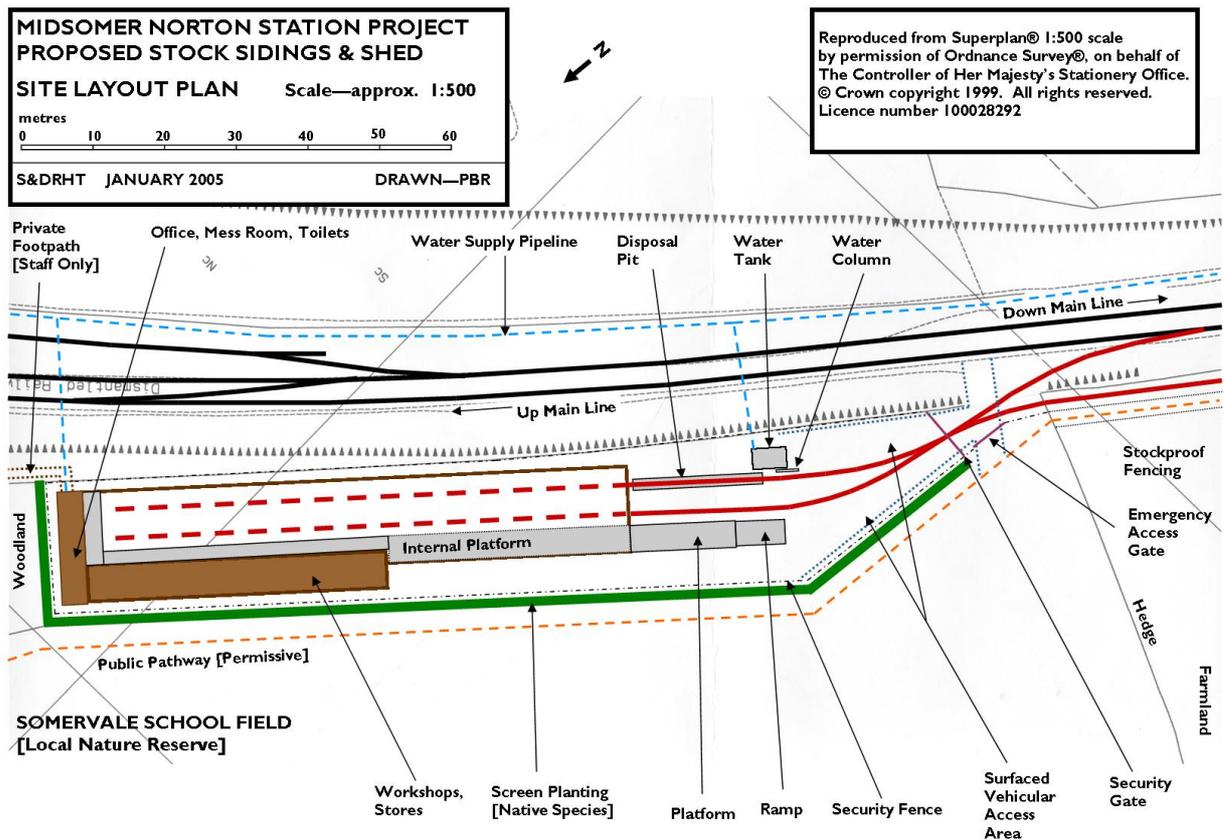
Proposed Siding and Shed Layout (S&DHRT)
